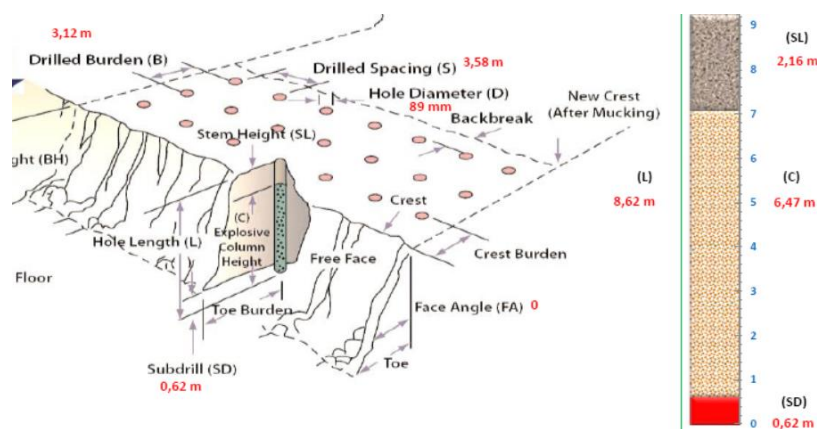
Schematic view of blasting plan for 0-2 ton stone range, Retrieved from Uğur Kara, owner of blasting company.
